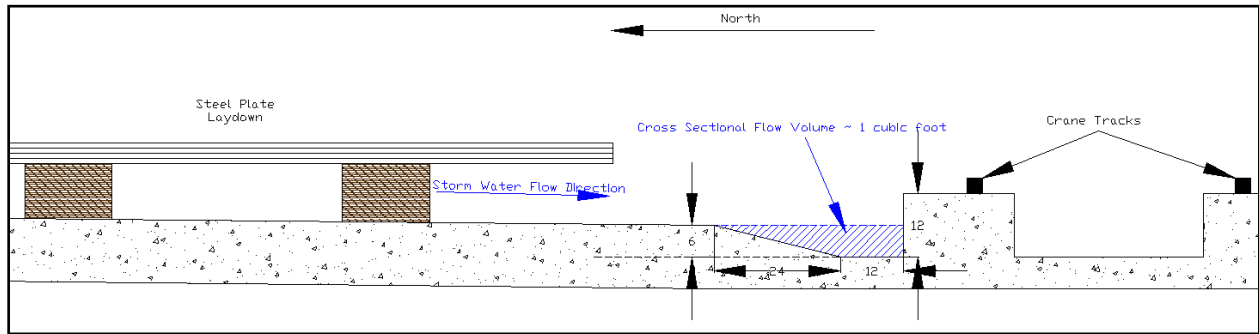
Cross Section of Plate Laydown Yard Drainage Ditch
